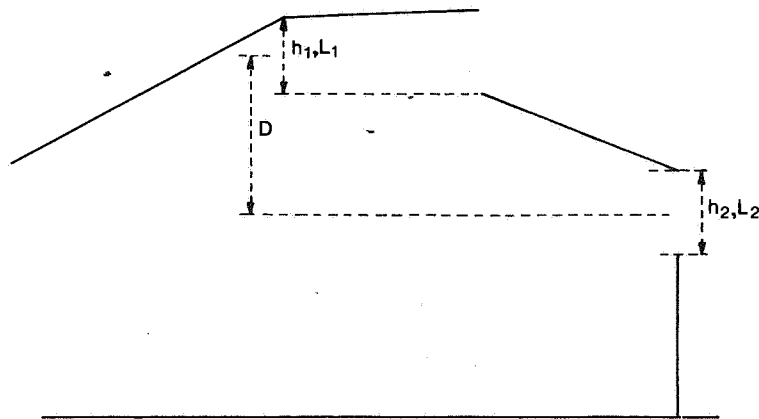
Roof and side wall opening arrangement of the example discussed in the text.
